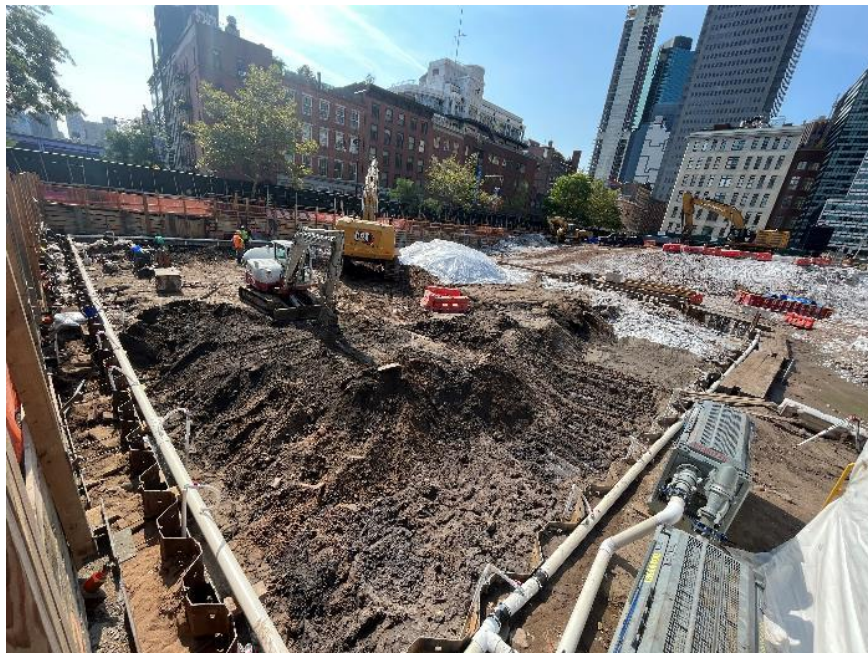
CCJV excavating petroleum-impacted soil/fill in the southeastern part of the site (facing southwest)
